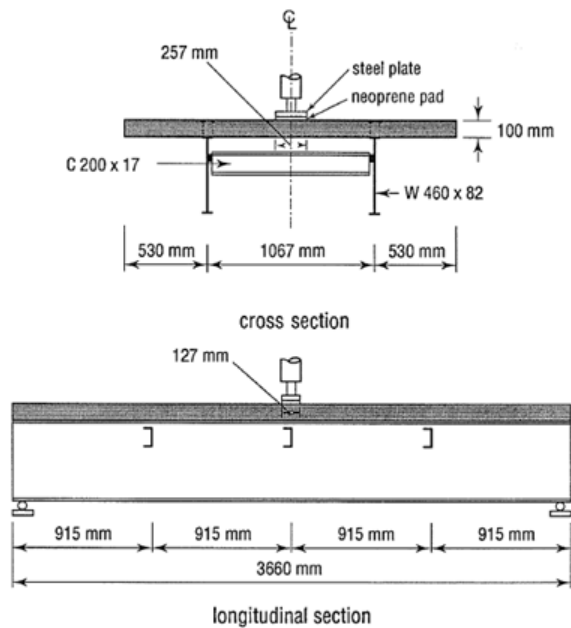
1/4 Scale Bridge Deck Test (Mufti et al 1993)
